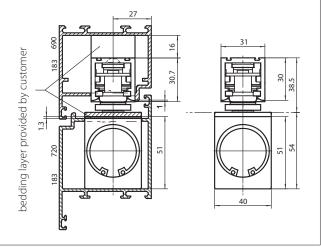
· Dimensions GEZE Boxer size 3-6 (ISM/E-ISM, aluminium door)
